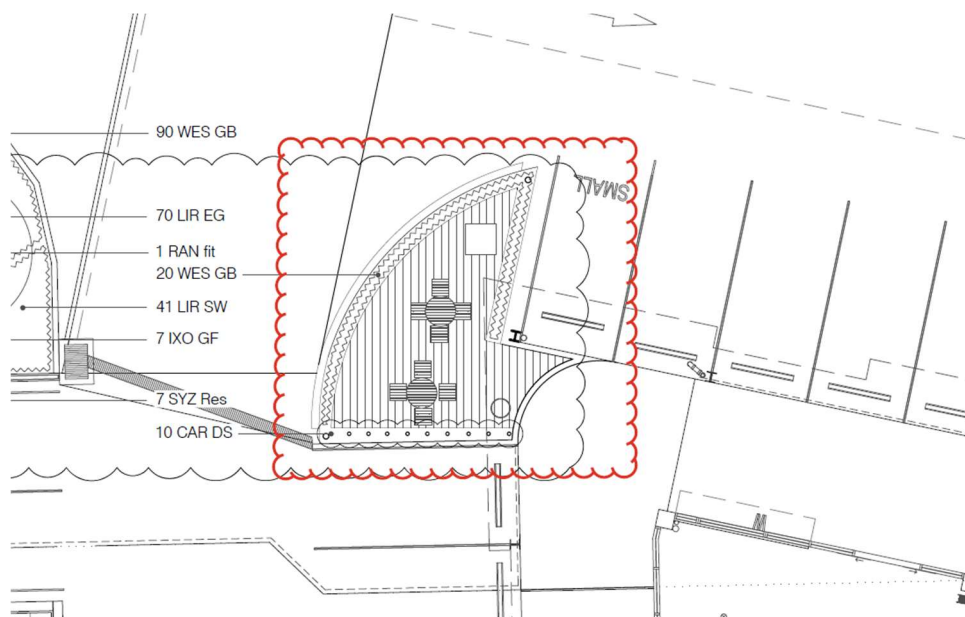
Minor Change Proposed Plan (Drawing No. LP.301 (Rev F))
